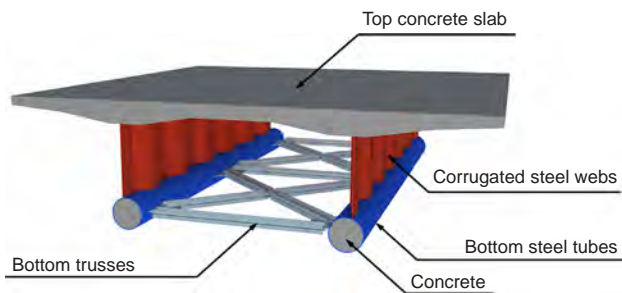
Typical cross-section of composite box girders with CSWs and trusses.
